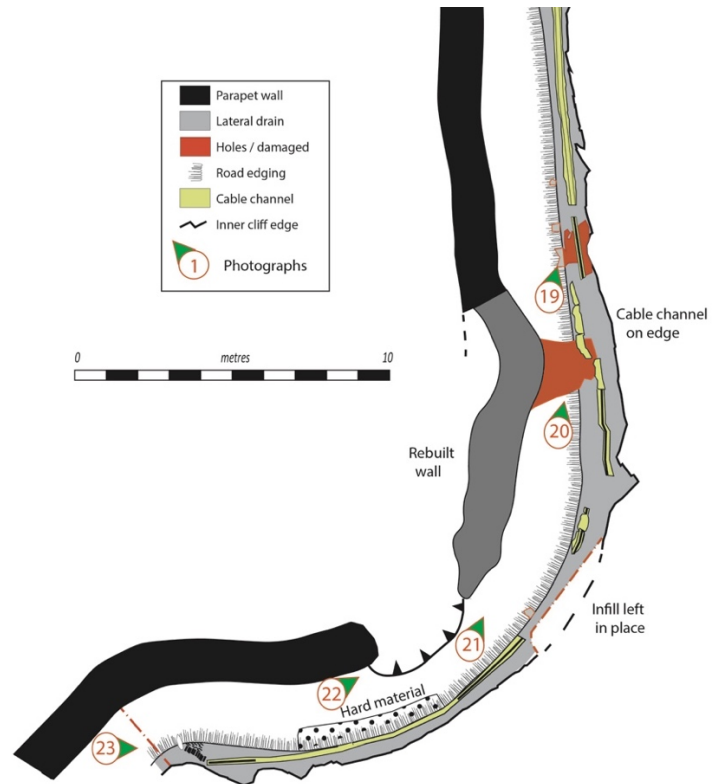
Plan of excavated roadway at location of Crash deck 2.
